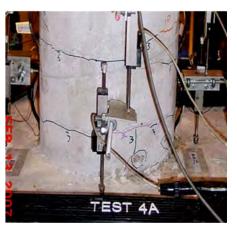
Apparent damage states for bent 1 East column top plastic hinge
